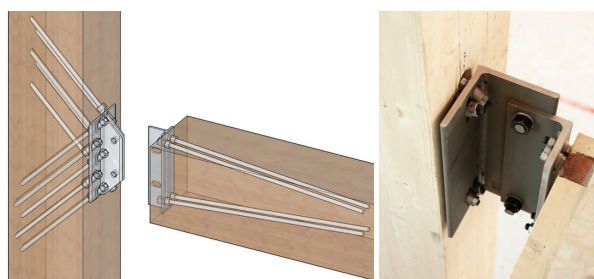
Woodsol connector concept (left, foto: Aivars Vilguts, NTNU) and picture of the connector installed between the columns and the floor element on the prototype (right, foto: SINTEF/A.- L. Bakken).
